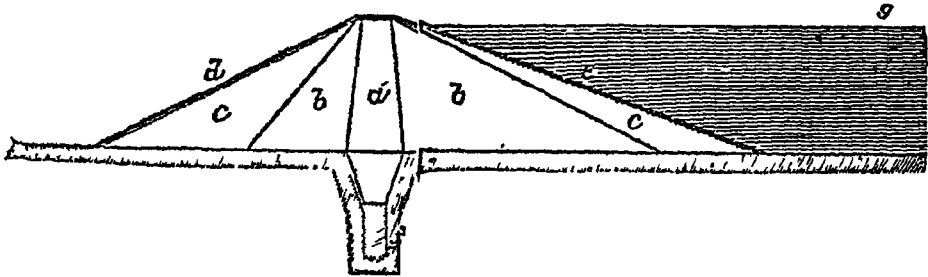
is a cross-section of an earthen reservoir dam : a is the core or hearting wall of clay puddle ; b, b the selected clayey material ; c, c is open stone filling ; d is stone pitching or turfing ; e is stone pitching ; f is a water-tight concrete wall in a soil permeable to a considerable depth ; g the level of water flowing down the escape channel or waste weir. (Scale 96 feet = 1 inch.)
